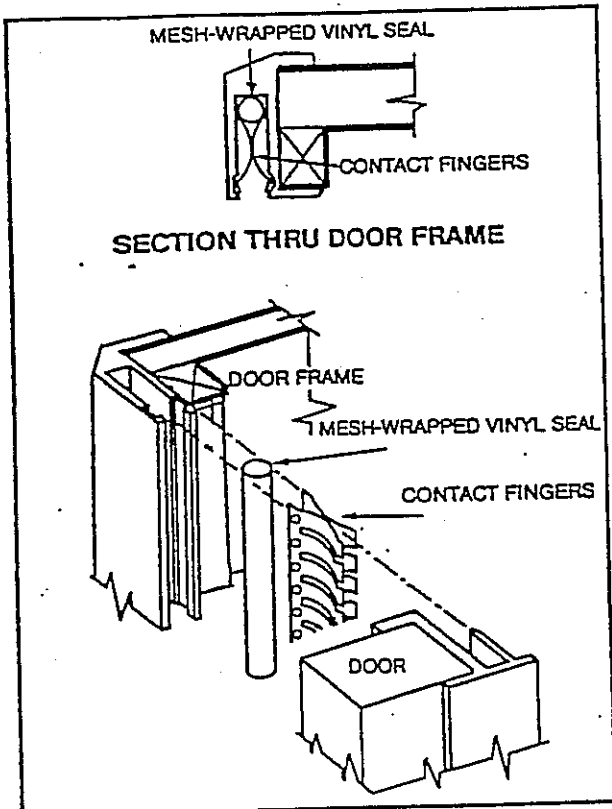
EXPLODED VIEW OF RECESSED CONTACT MECHANISM (RCM)
